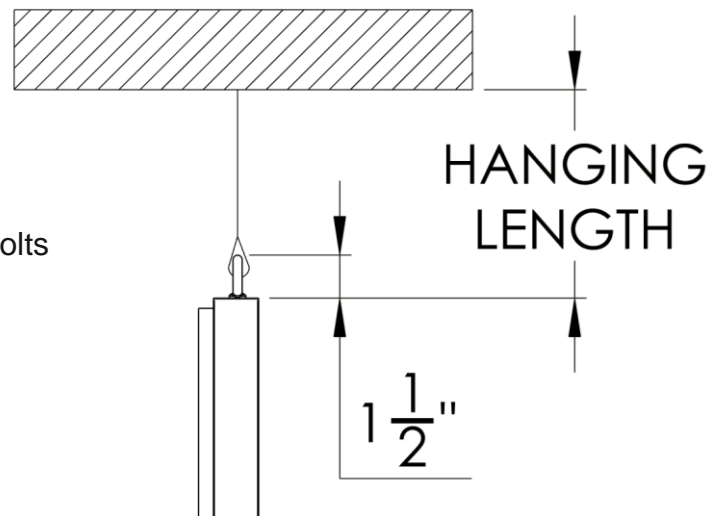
Side view profile drawing of WSDQ showing overall height of eyebolt. *Hanging length will be specific to your installation and not part of the Stewart Filmscreen mounting system.
